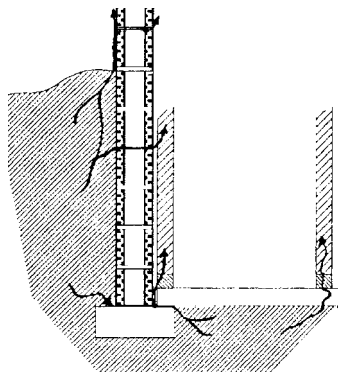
Basement construction (arrows indicate possible termite entry points).
